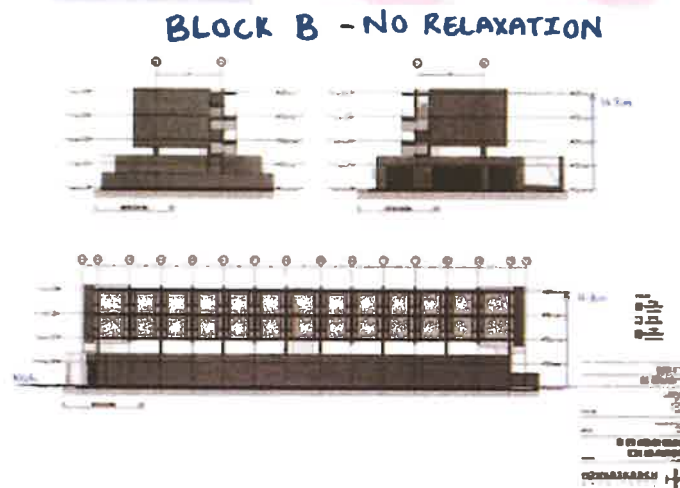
Elevation plan for Block B. No height relaxation is proposed.
